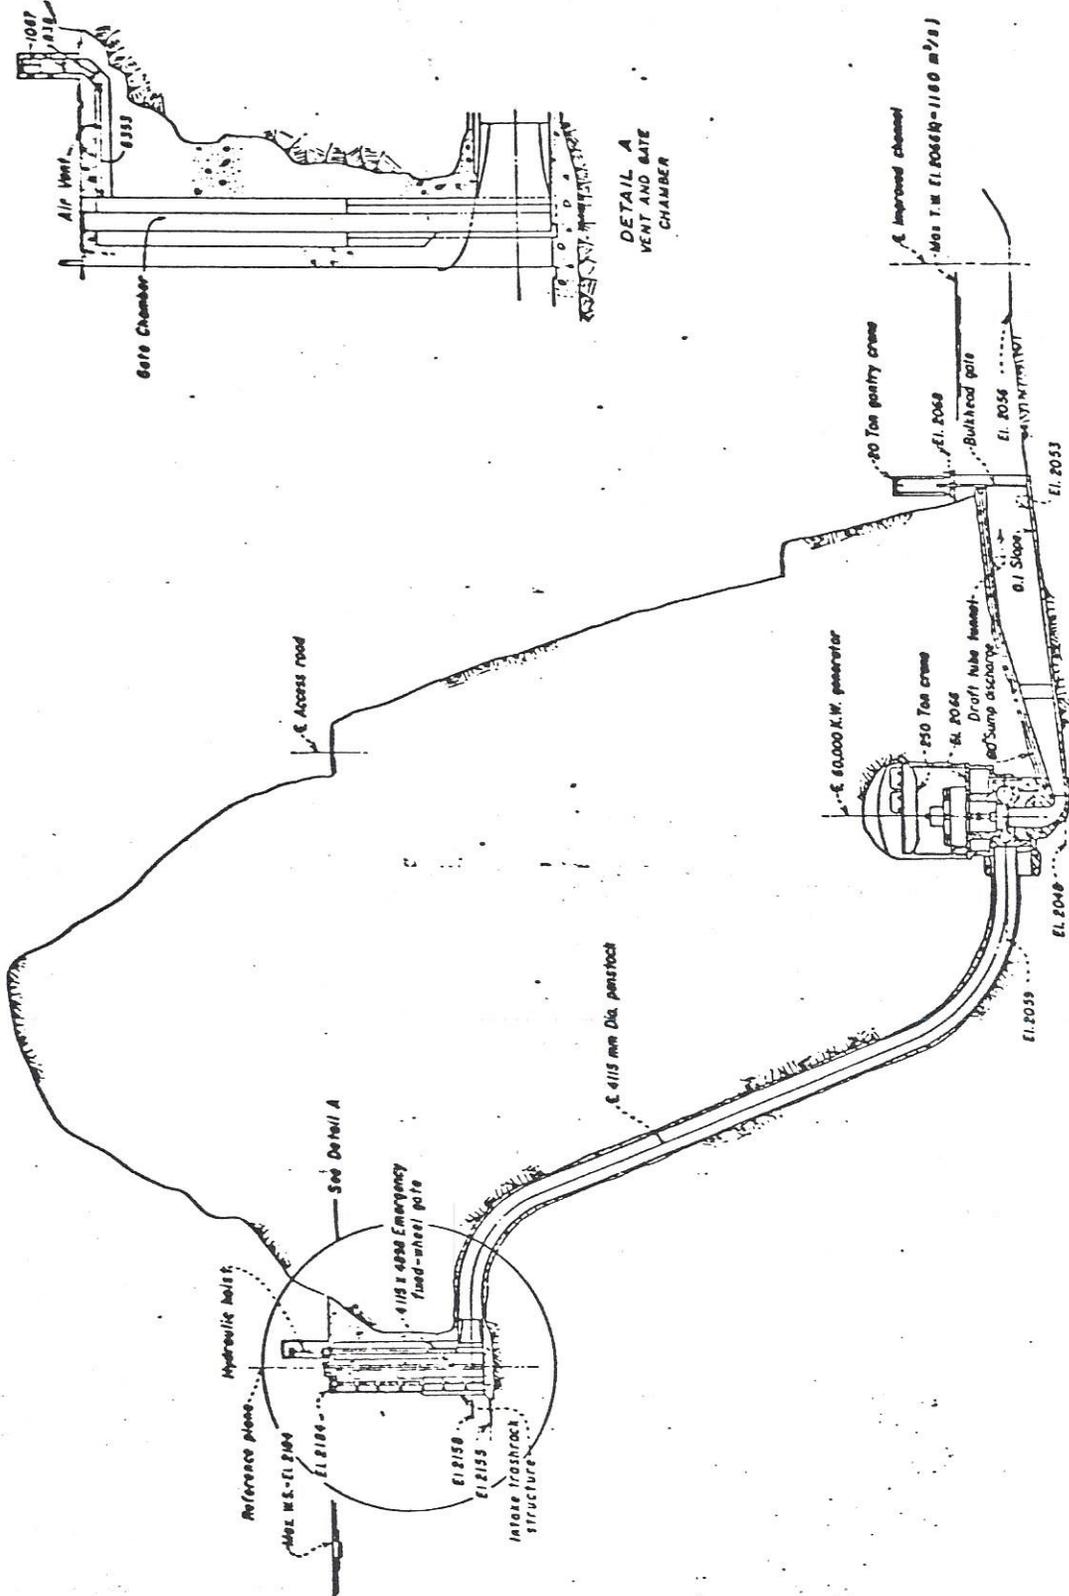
SECTION THRU PENSTOCK AND POWER PLANT
